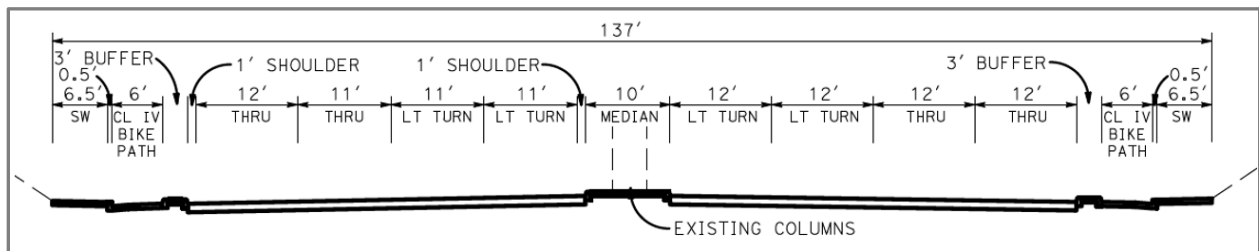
Alternative 4 – Middlefield Road Cross-Section
